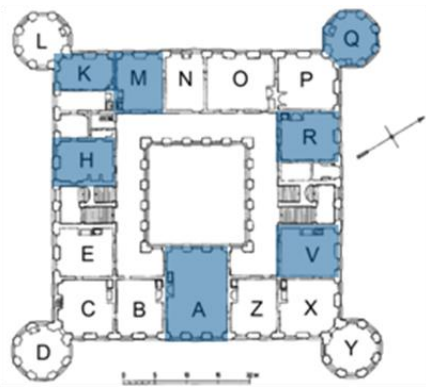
Plan of the first floor of Skokloster Castle. The analysed rooms are highlighted.
